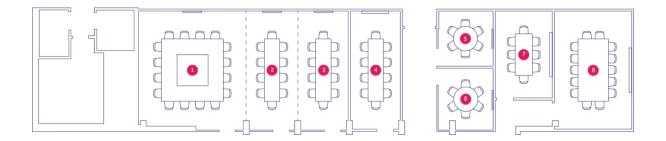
Organisation C Ground Floor meeting room floorplan
